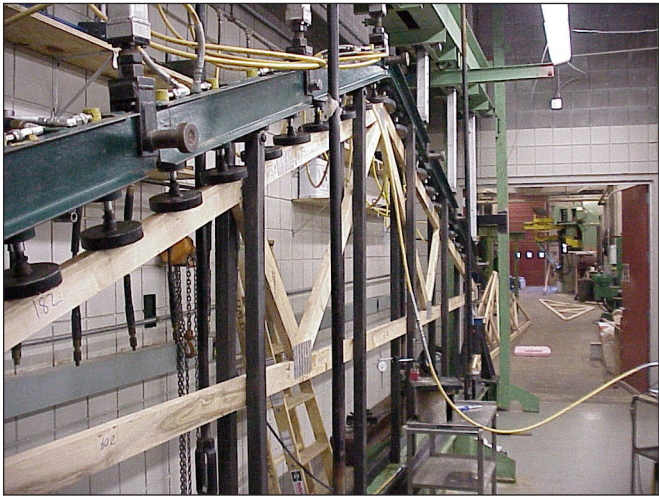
Hardwood pitched chord truss during full-scale testing.
